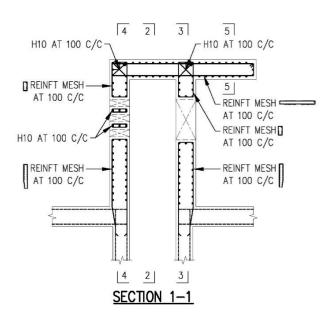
ENCASEMENT DETAILS OF WATER/GAS SERVICE PIPES PENETRATING THROUGH HS WALL
